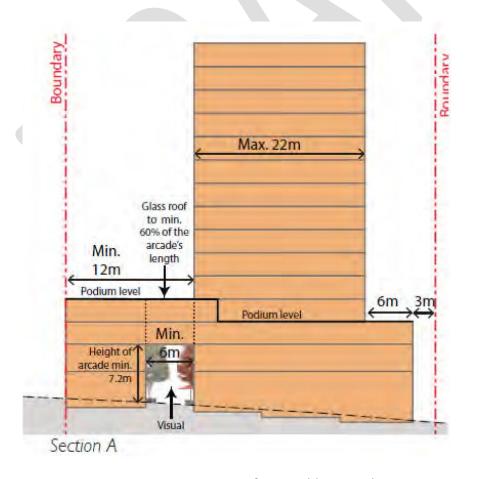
East-West Section of Site Building Envelope
